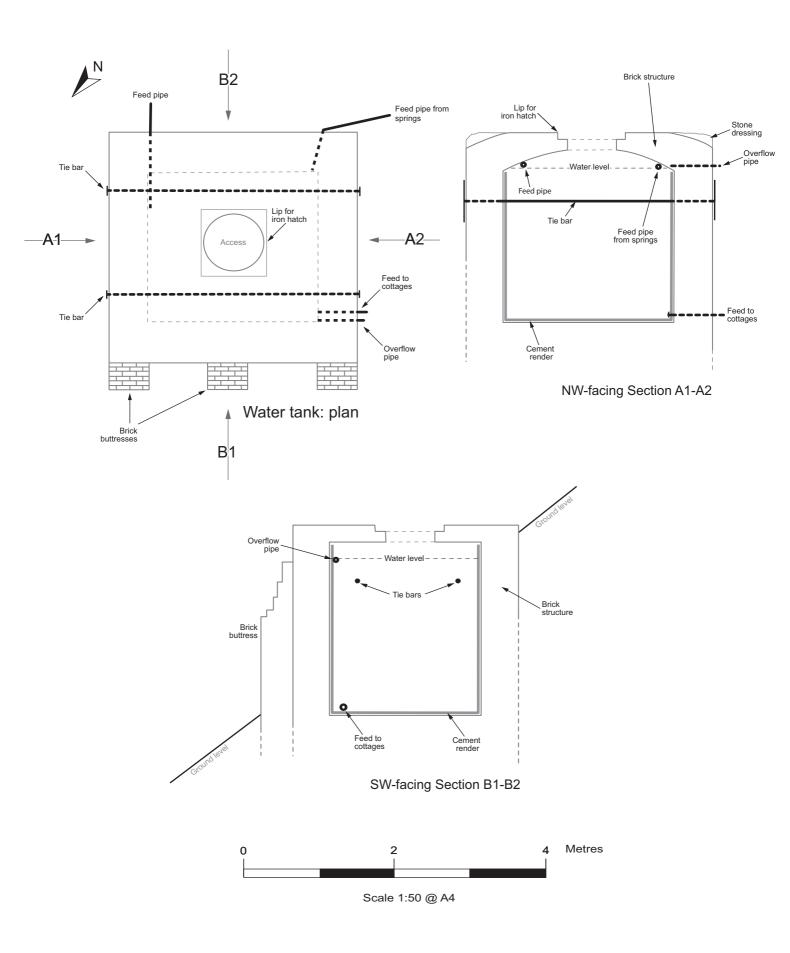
Plan and cross-sections of the water tank at Church Park Cottages, Kingswear.
